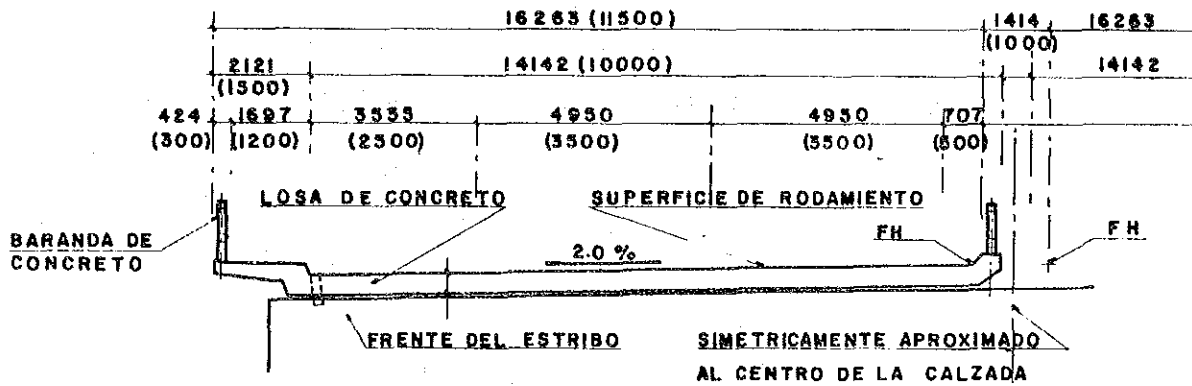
Typical Superstructure Section of La Morita Bridge, RC-Slab
